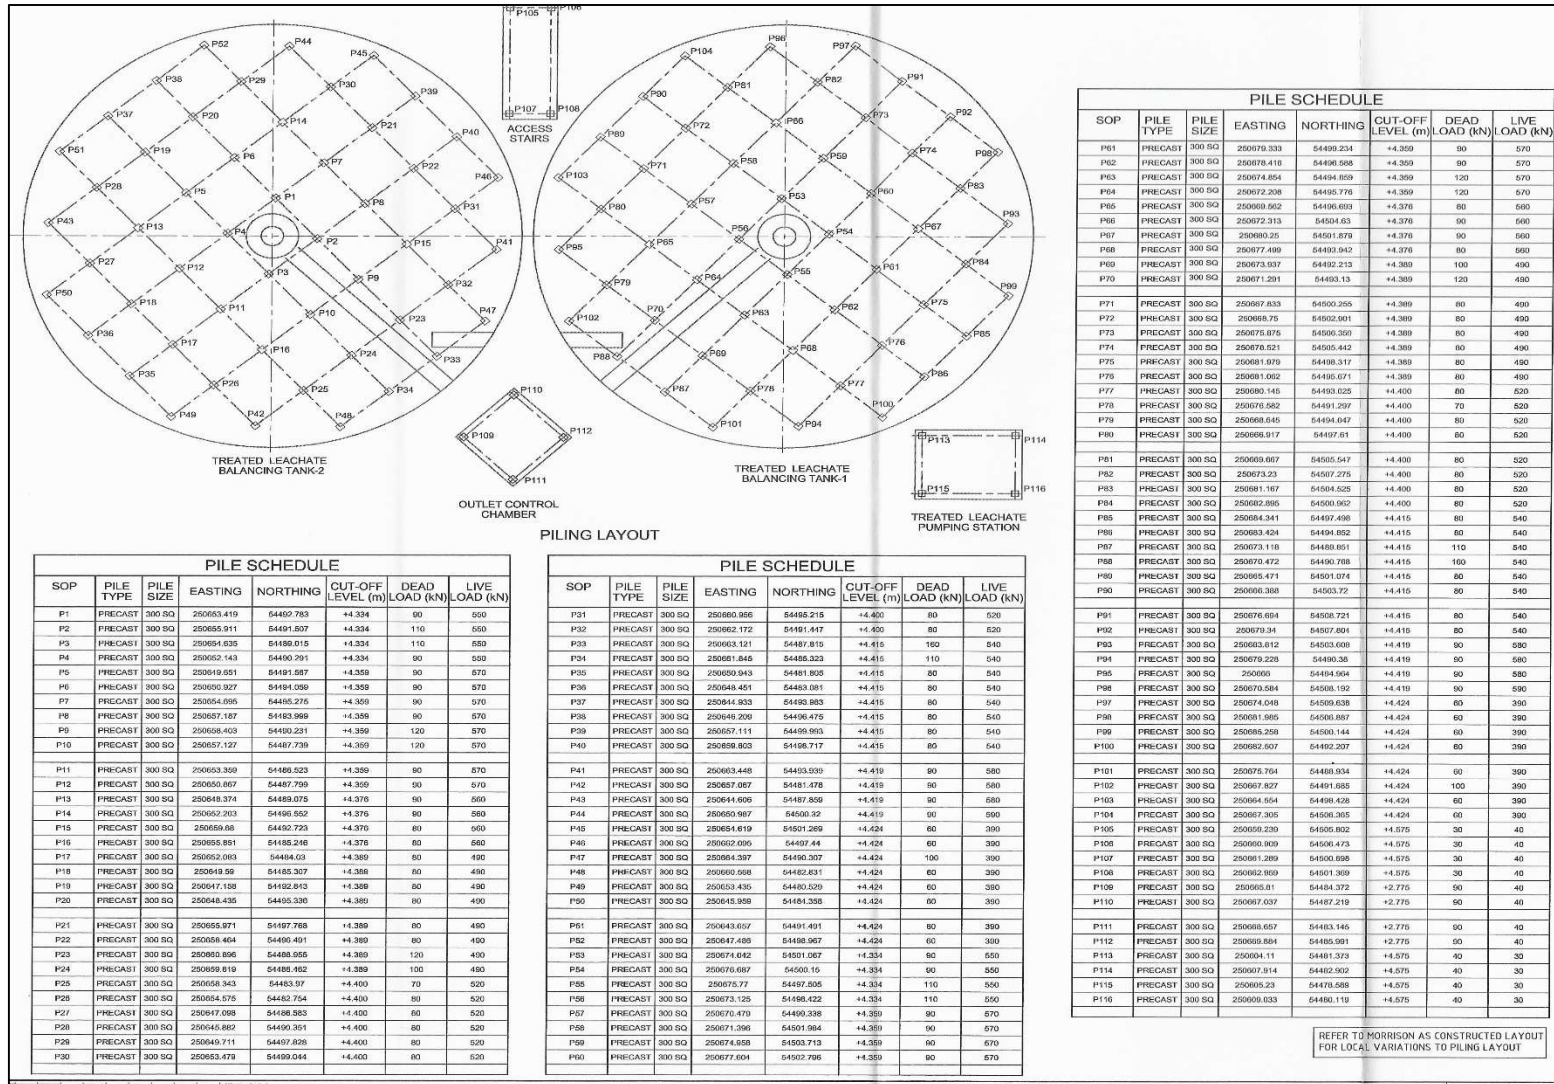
Locations and depths of pile foundations for construction of STORs 1 & 2
